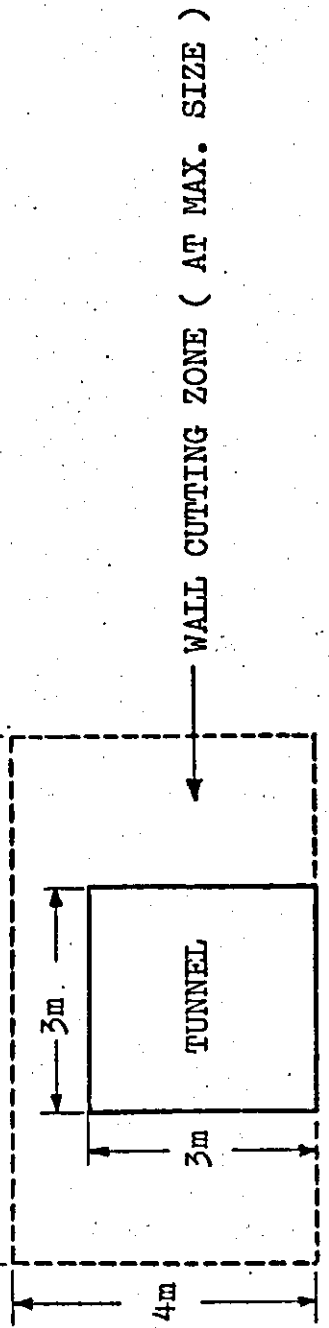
PLAN OF THE PROPOSED TUNNEL AND THE MINING WORK Scale 1 : 500
